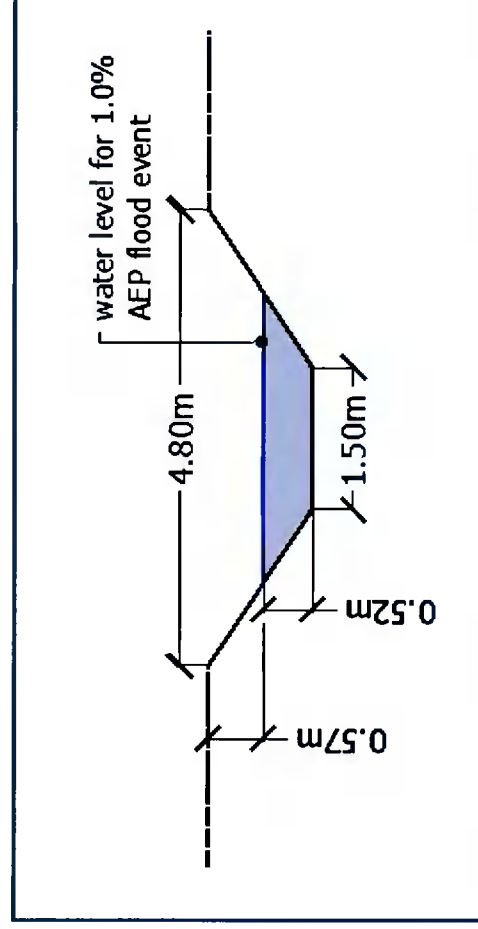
Typical Section through Relief Road and Realigned Stream
